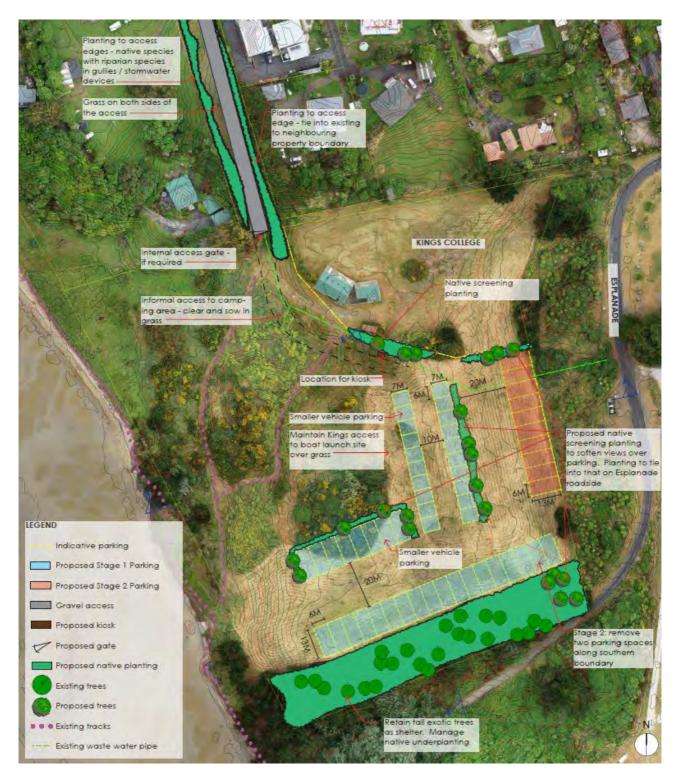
Snapshot of Landscape Plan showing proposed layout of parking bays and landscaping
